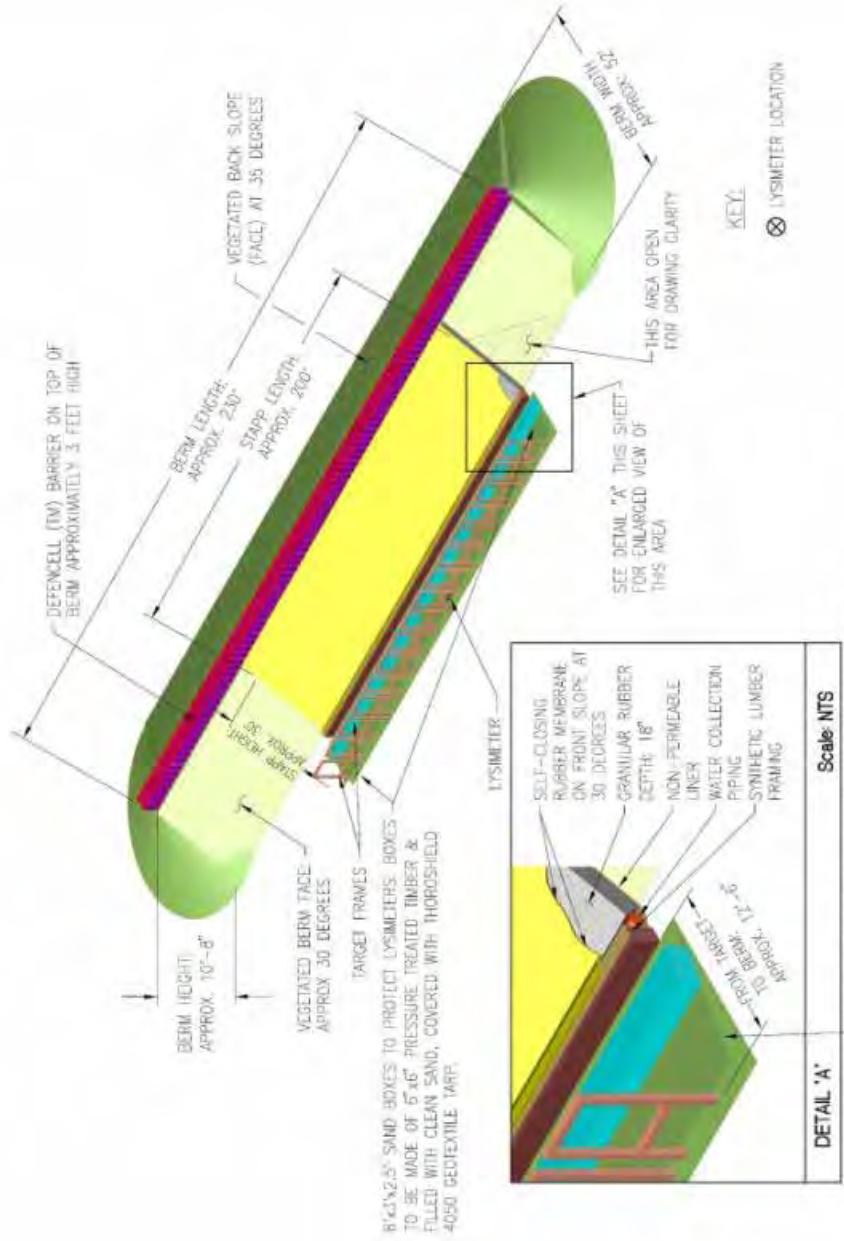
Drawing of STAPP™ Bullet Containment System
